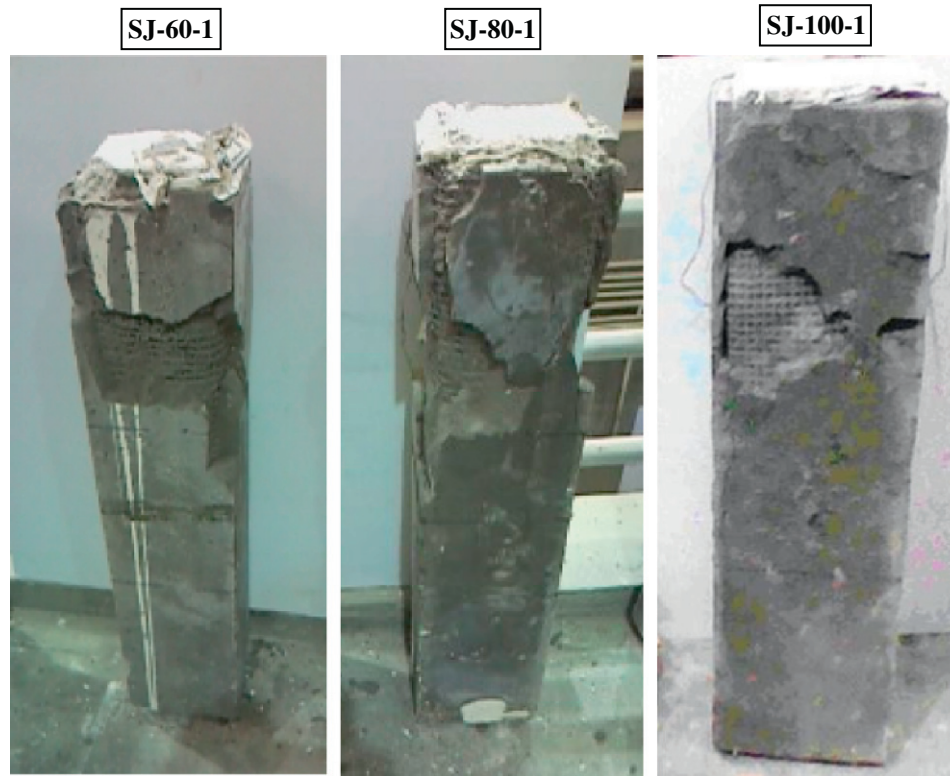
Typical failure modes for column specimens jacketed after preloading.
